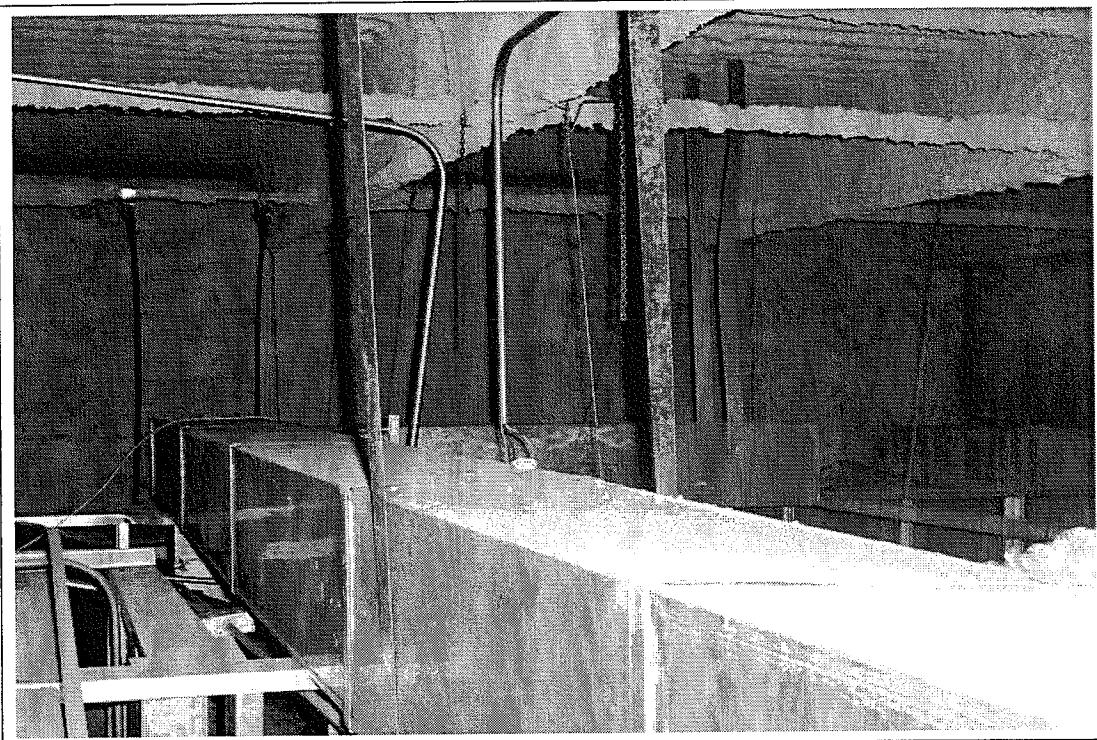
Main Terminal, 3rd floor, Men's Rest Room - View of delaminated fireproofing dust and debris on top of metal HVAC duct
